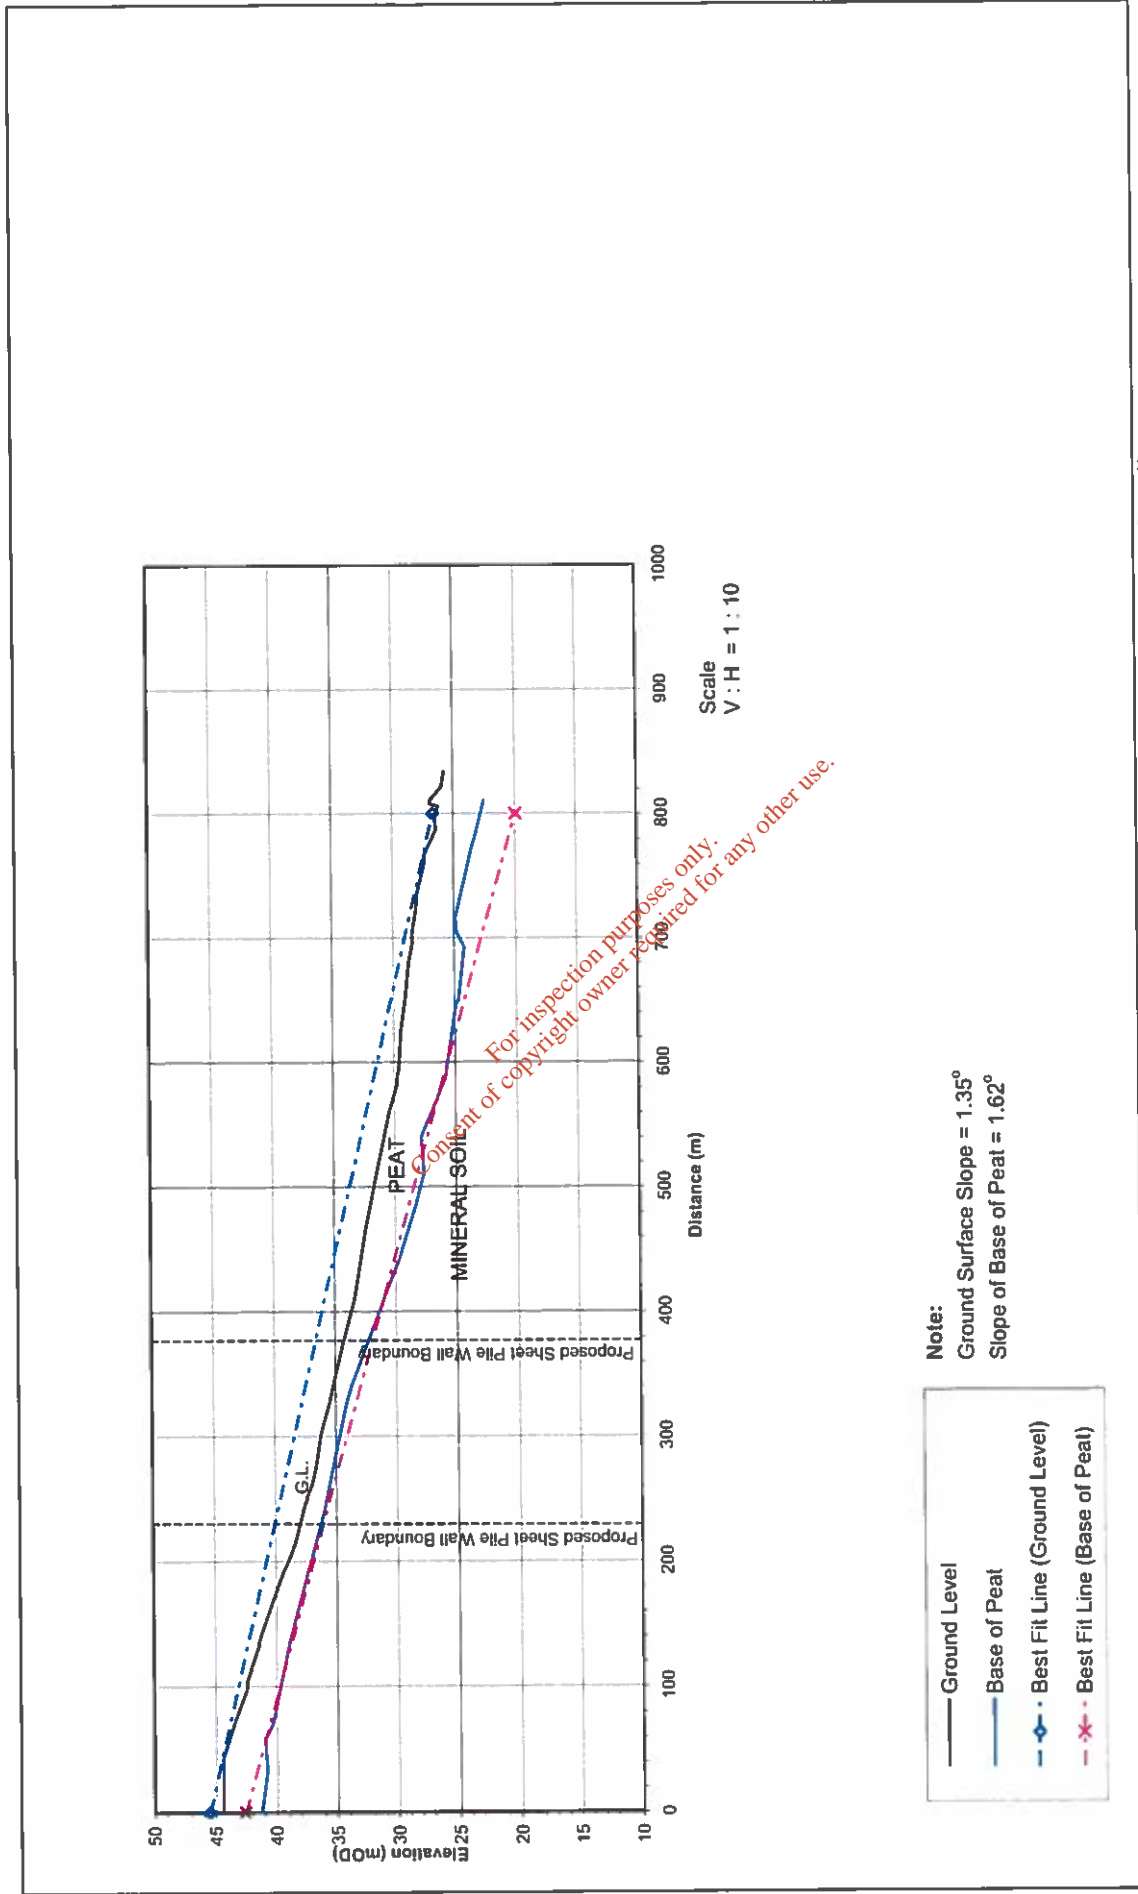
Typical Cross-section along Eastern Area and Temporary Construction Facility (Cross-section 4)
